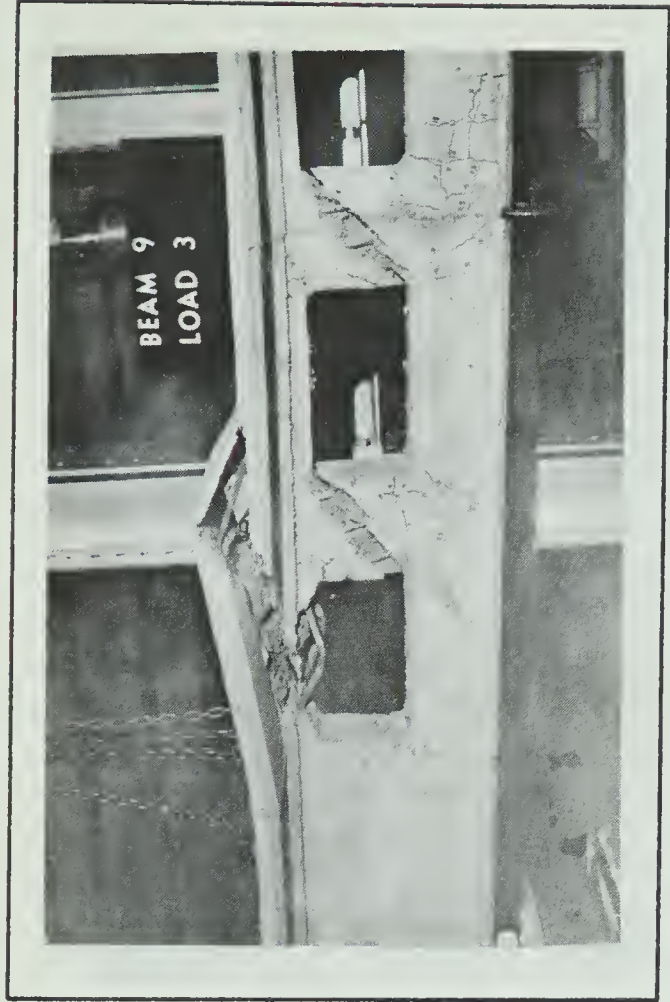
BEAM #9 CRACKING AND FAILURE PATTERNS
